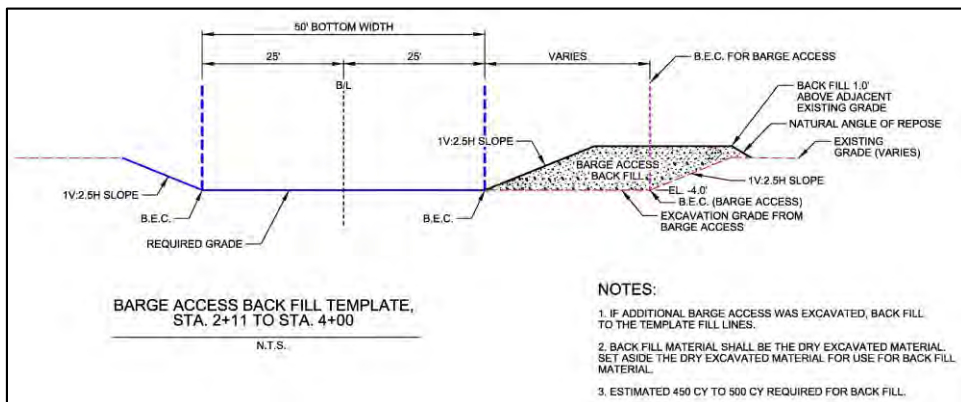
Bayou aux Carpes access channel backfill cross-section view
